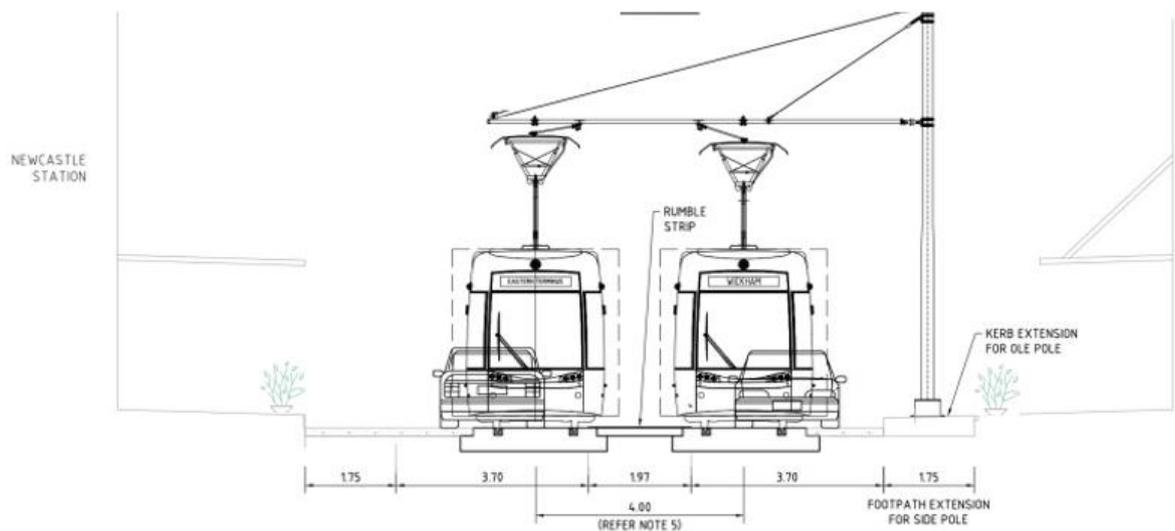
Typical cross section along Scott Street near Newcastle Station (mixed running)
